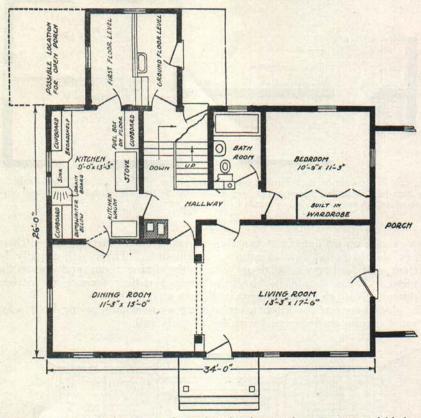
A well arranged, compact floor plan showing good arrangement of kitchen as related to other rooms, basement, and second story.
